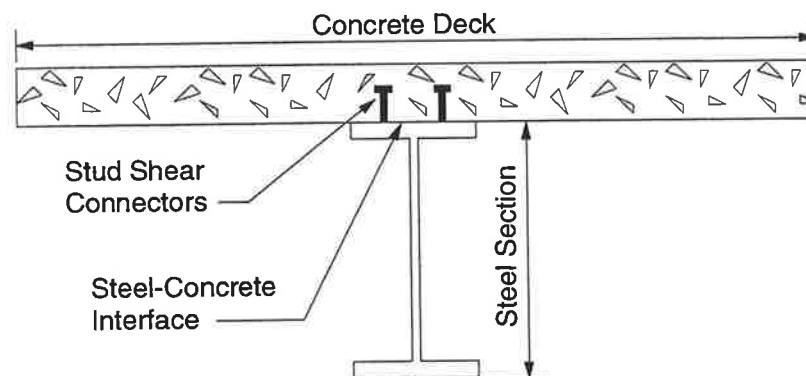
Typical composite steel-concrete bridge beam cross-section.
